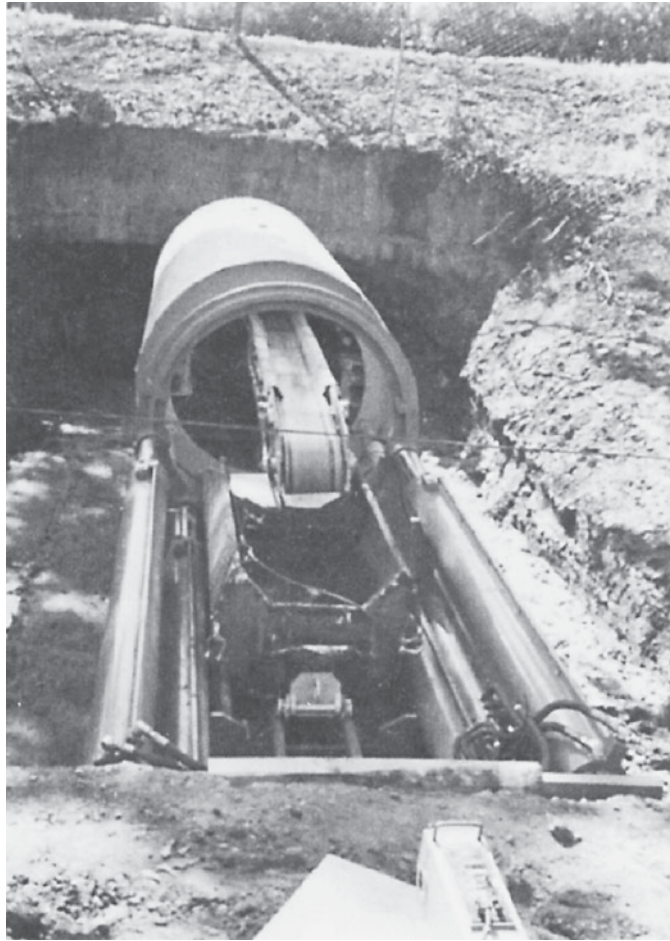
(continued) (b) pipe-jacking operation. (Courtesy of Astec Underground/American Augers)
